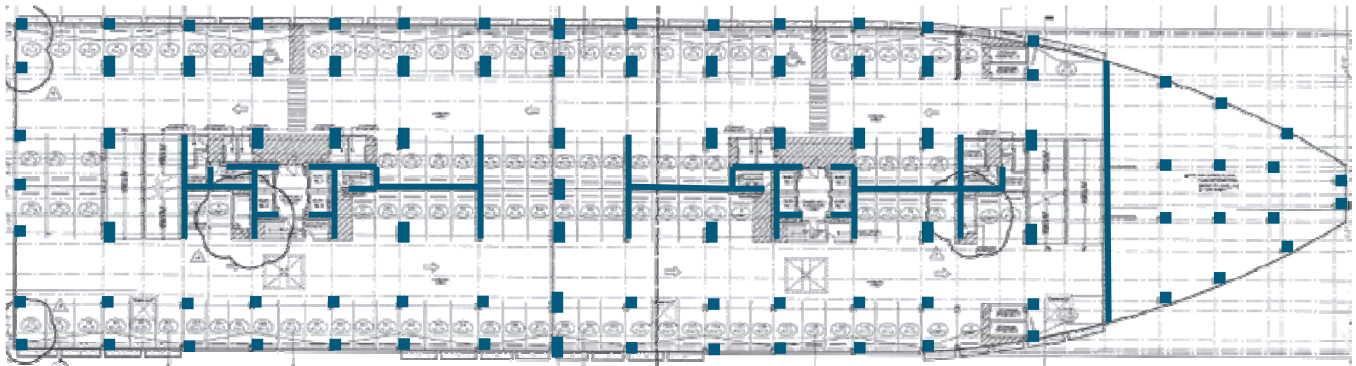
Column and Shear Wall Layout for Typical Parking Garage Level
